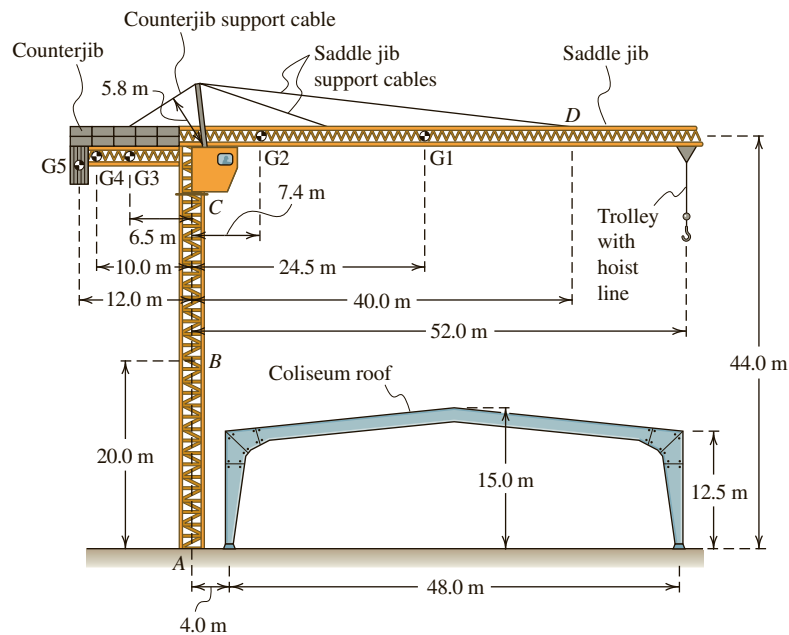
Layout for placing concrete panels with fixed tower crane (Option A).
